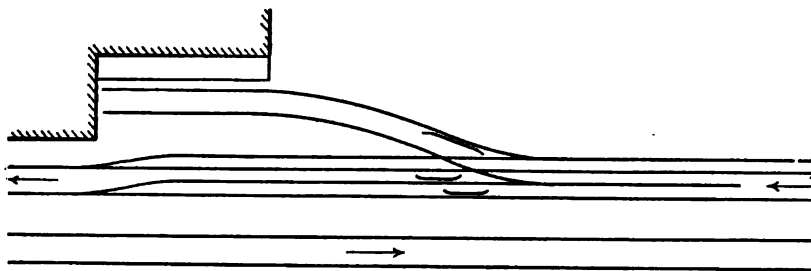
Gauntlet track arrangement to avoid facing point turnout.
